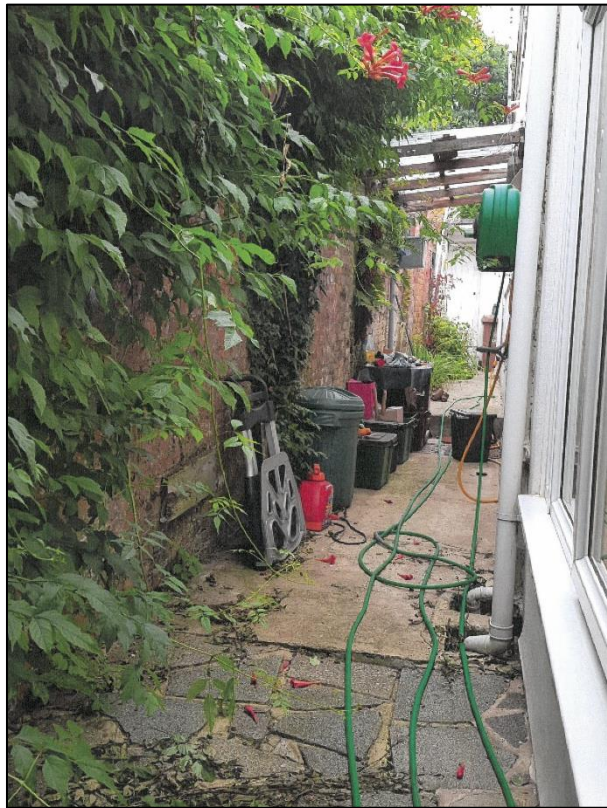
North boundary wall of No. 20 St James Way (Urban and Rural Ltd)
